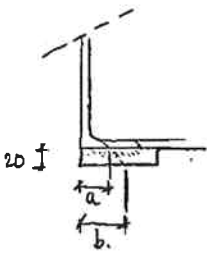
DETAIL: CONNECTION ON CONCRETE "BRIDGE"
